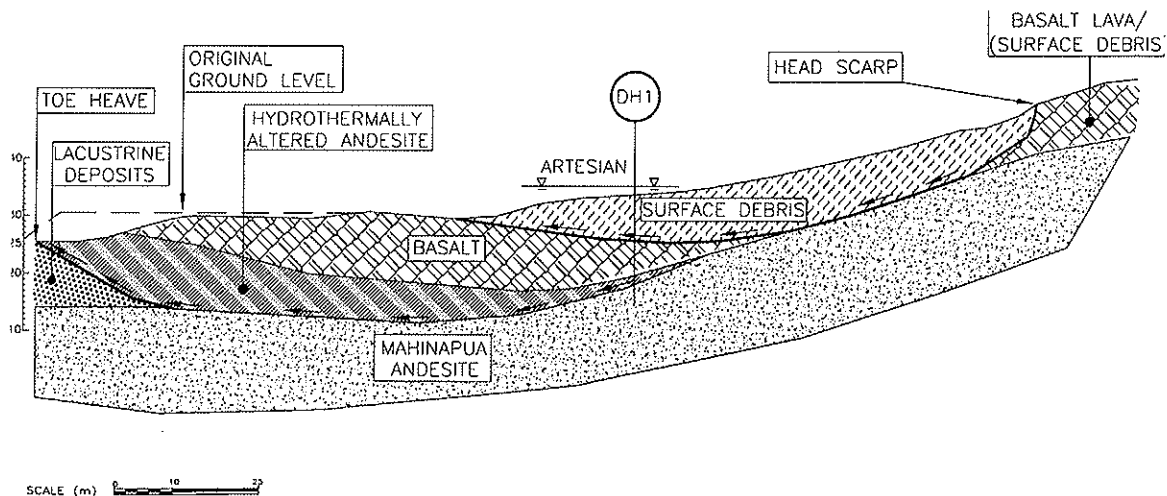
Geological Cross Section of Ohinau Drive Failure
